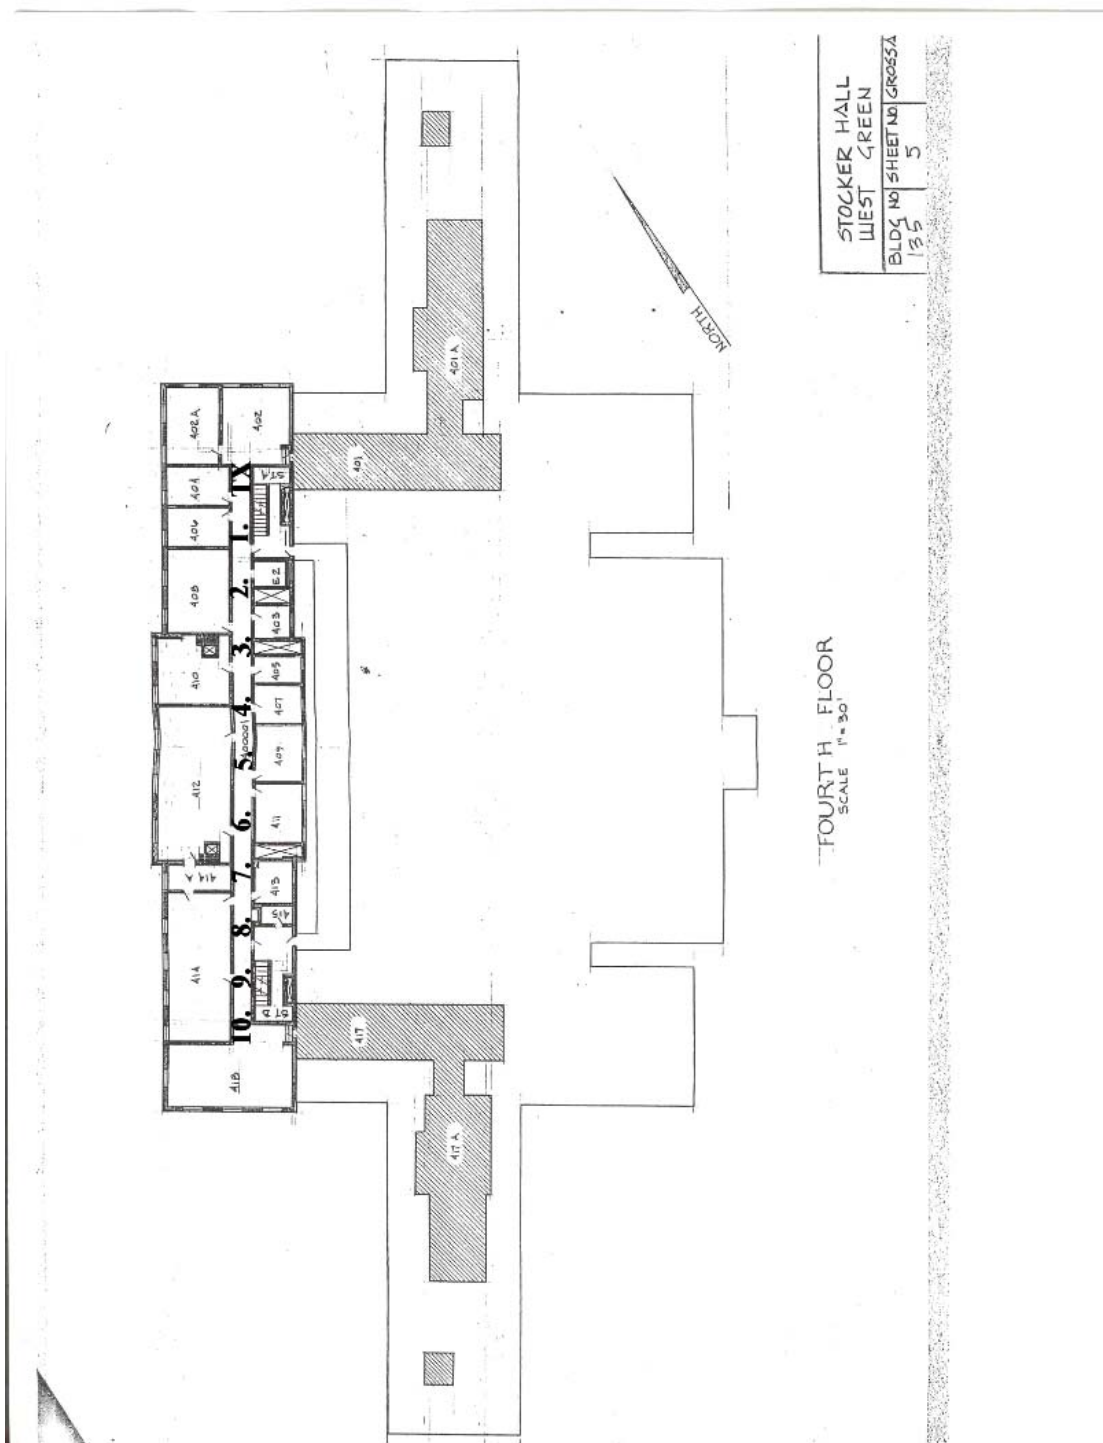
Layout of floor plan of fourth floor with transmitter and receiver locations.
